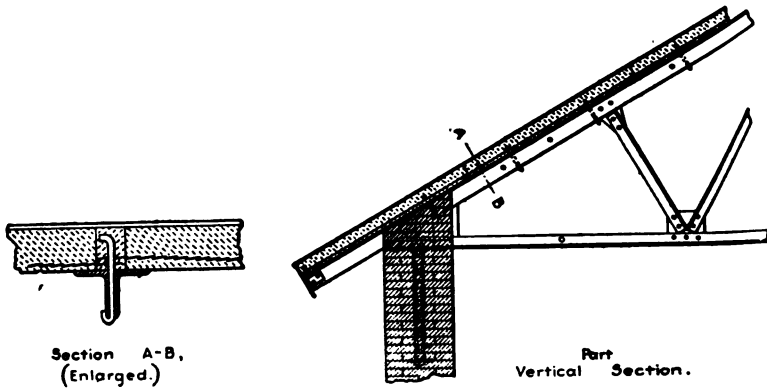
Slab and Steel Frame Roof, Chittenden Power Co.'s Warehouse.
